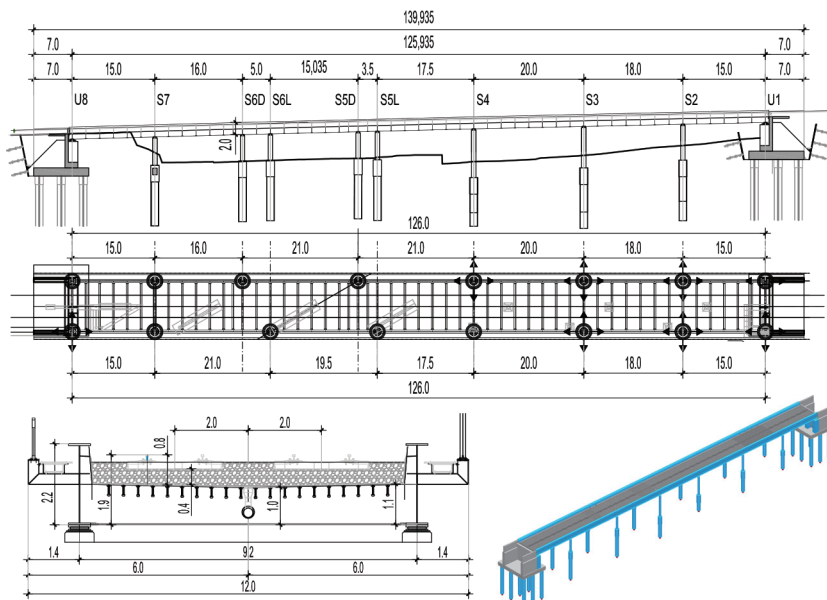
Longitudinal section, cross section, and layout of the case study bridge
